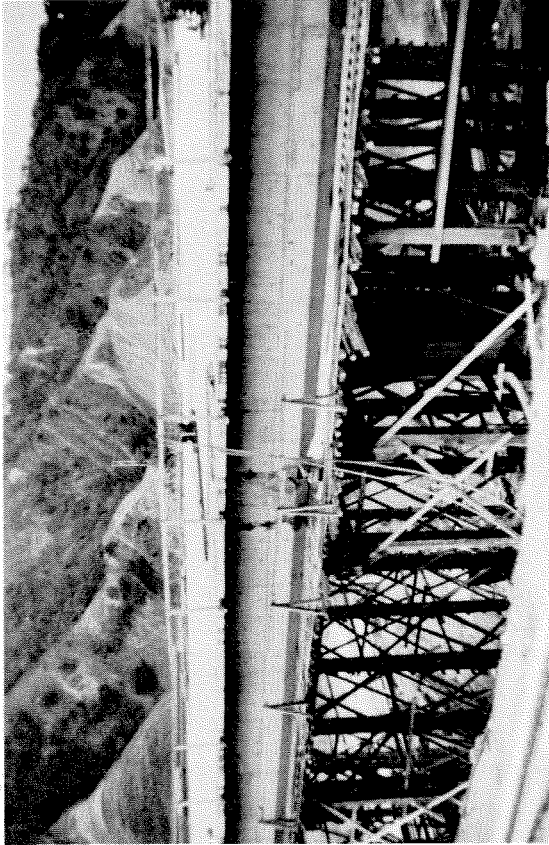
Damage caused by settlement of falsework, Golden State-Antelope Valley freeway interchange.
